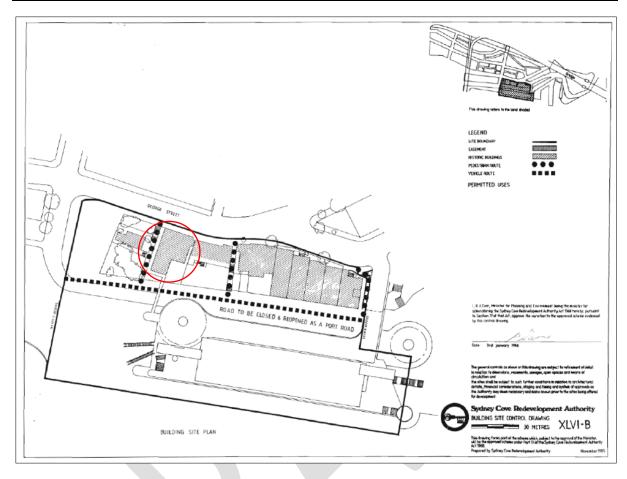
SCRA Building Site Control Drawing 'XLVI-B' showing the building envelope circled in red. (Source: City of Sydney)
